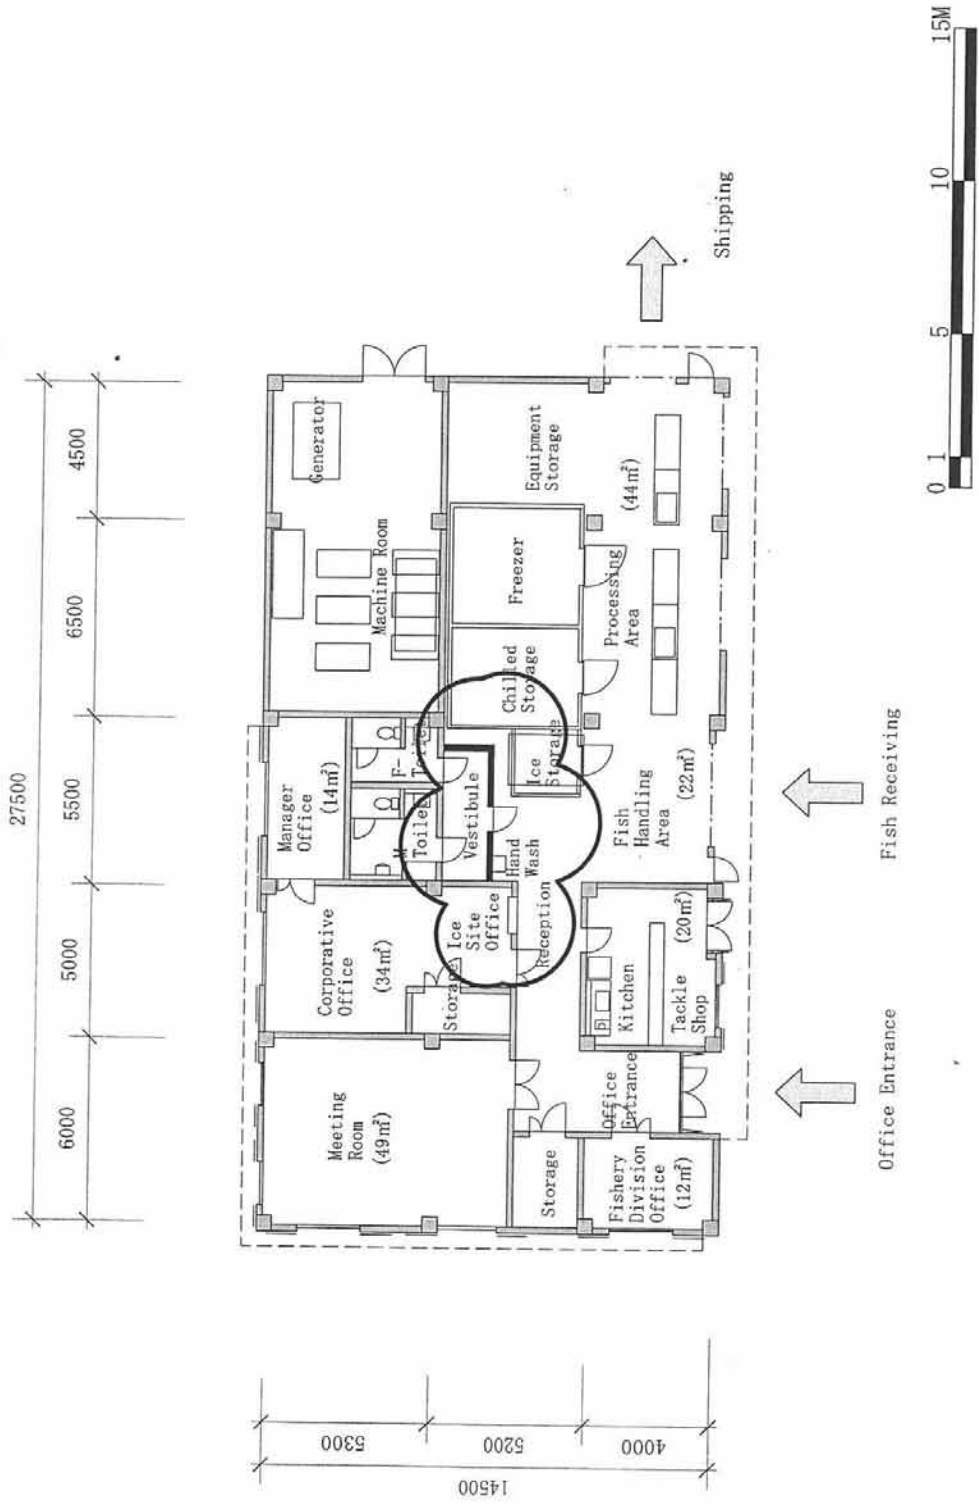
(10) Floor Plan for the Fishery Center Building
